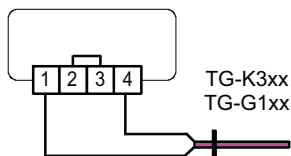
Wiring of floor or duct sensor when using internal setpoint
